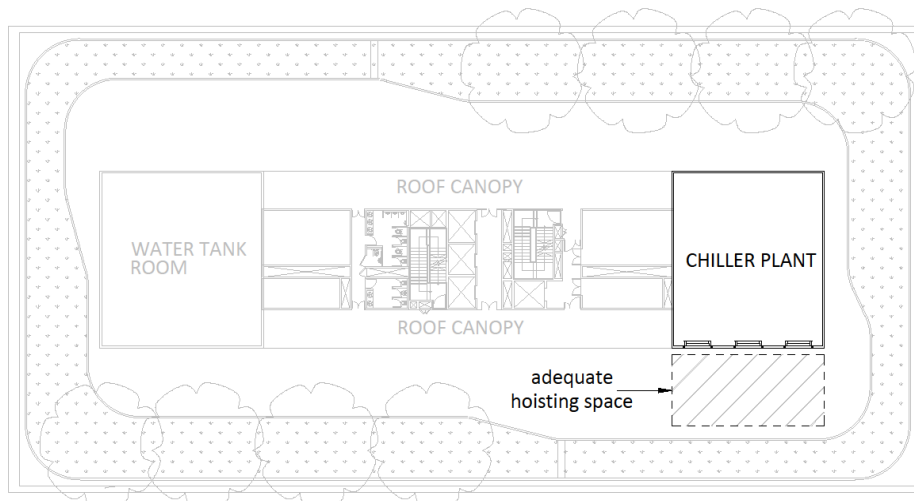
Rooftop chiller plant with operable opening and adequate hoisting space
